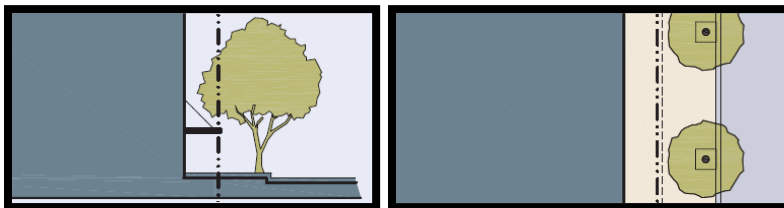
E. ARCADE BUILDING FRONTAGE.
